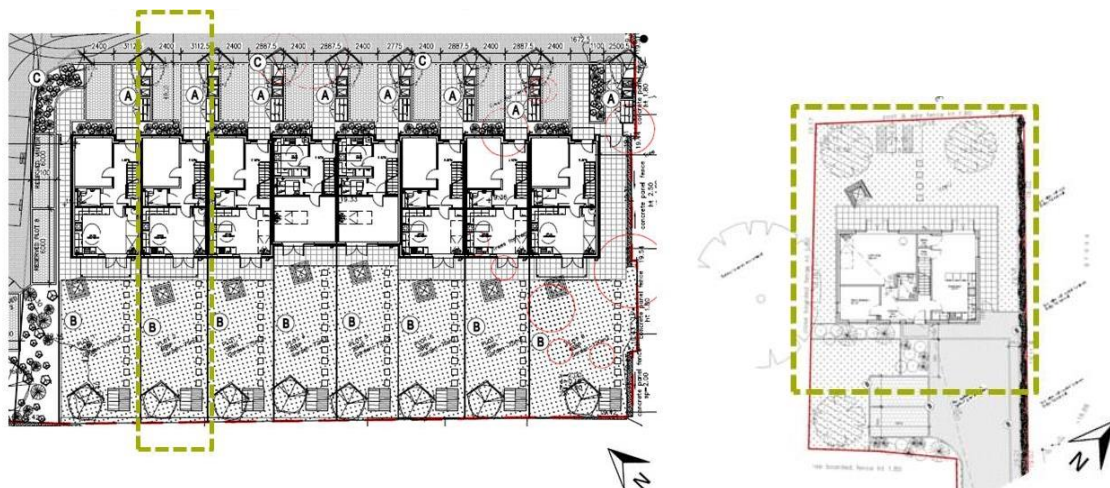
Thames Valley development, plan and elevations. (Left) House 1. (Right) House 2.
